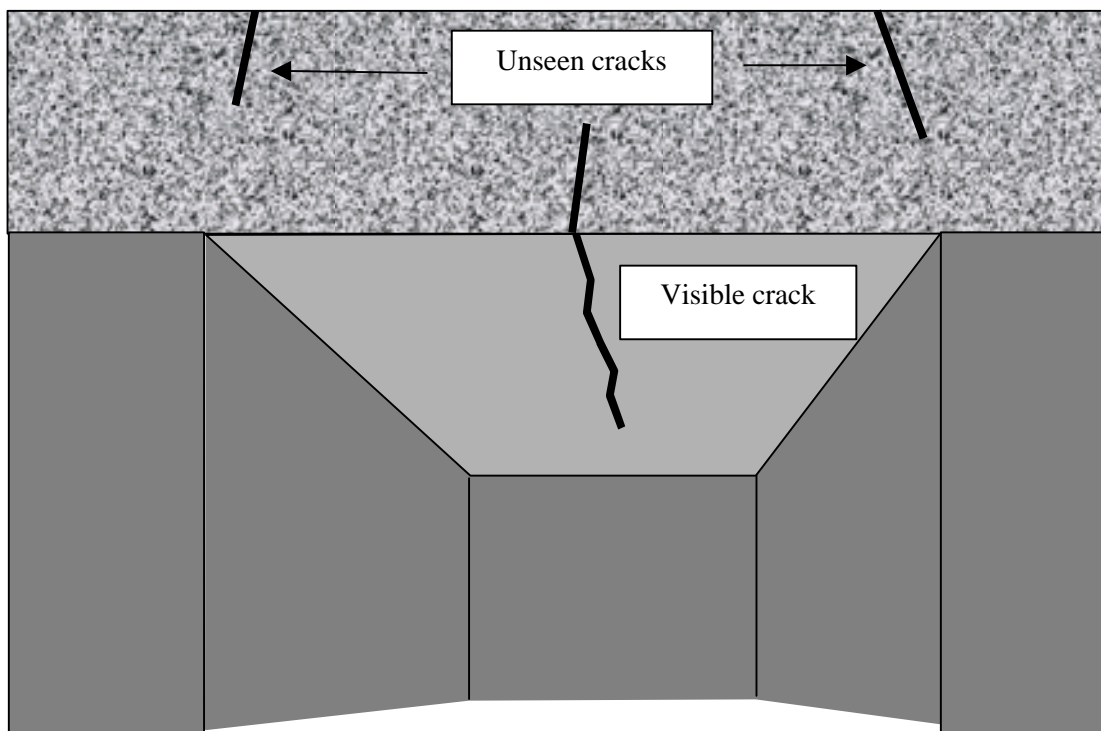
A tension crack, indicating one of the most dangerous situations underground.
